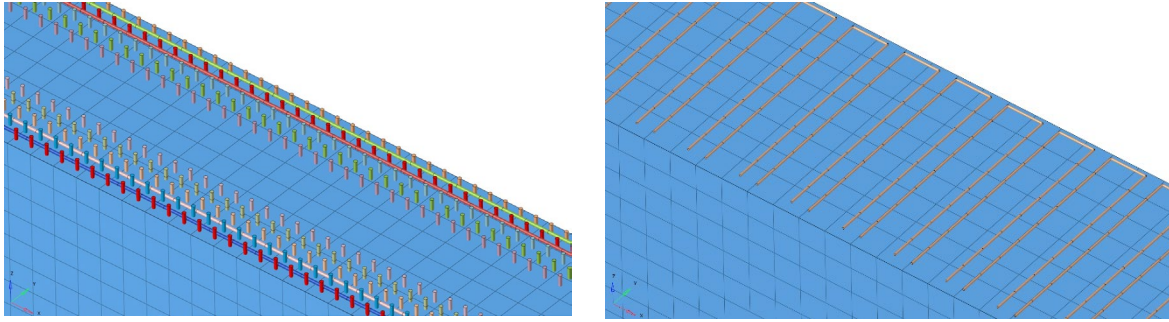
FE-Modell of RC-wall: bending reinforcement (left) and shear reinforcement (right).
